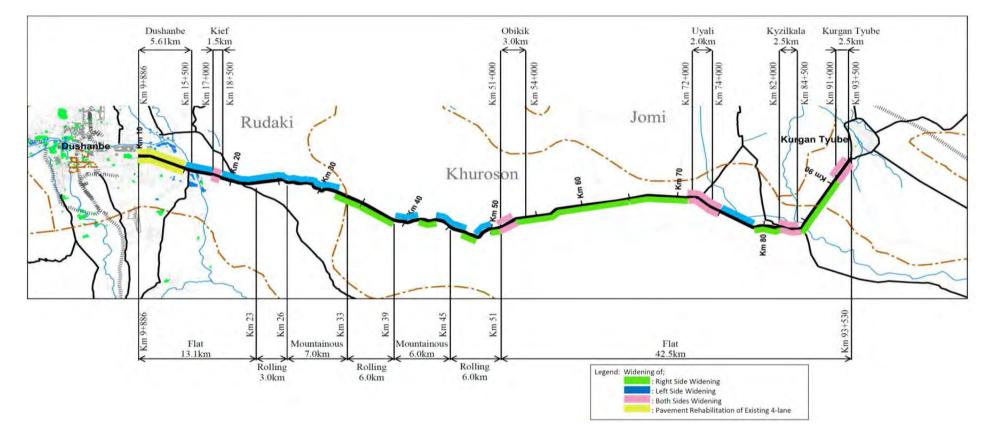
WIDENING TO 4-LANE: RIGHT SIDE, OR LEFT SIDE OR BOTH SIDE
